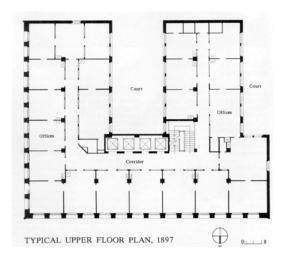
Guaranty Building plan, Buffalo, New York (public domain).
